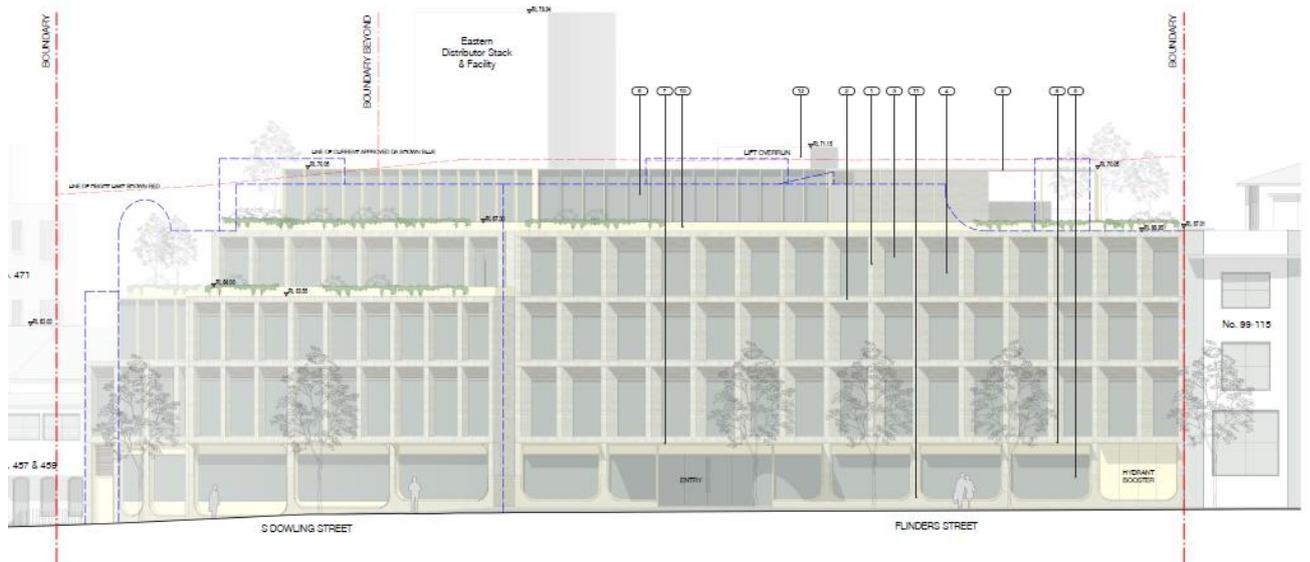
Proposed Eastern Elevation (South Dowling and Flinders Streets)
